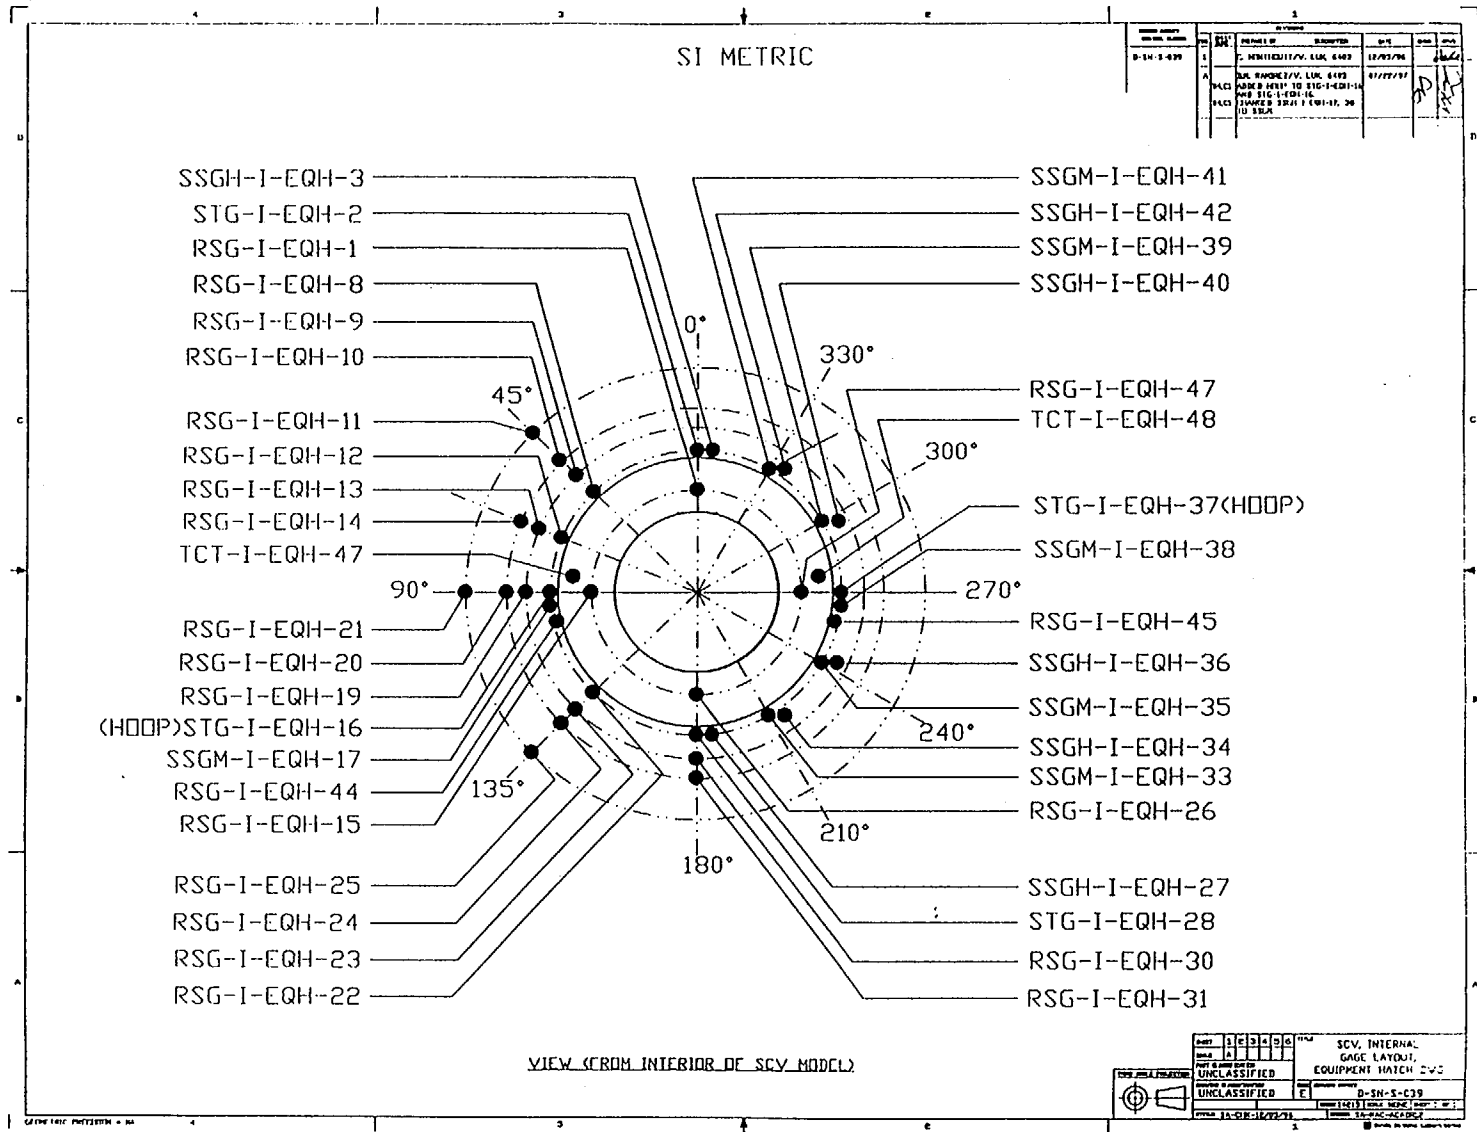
Steel containment vessel (SCV) internal gage layout around equipment hatch.
